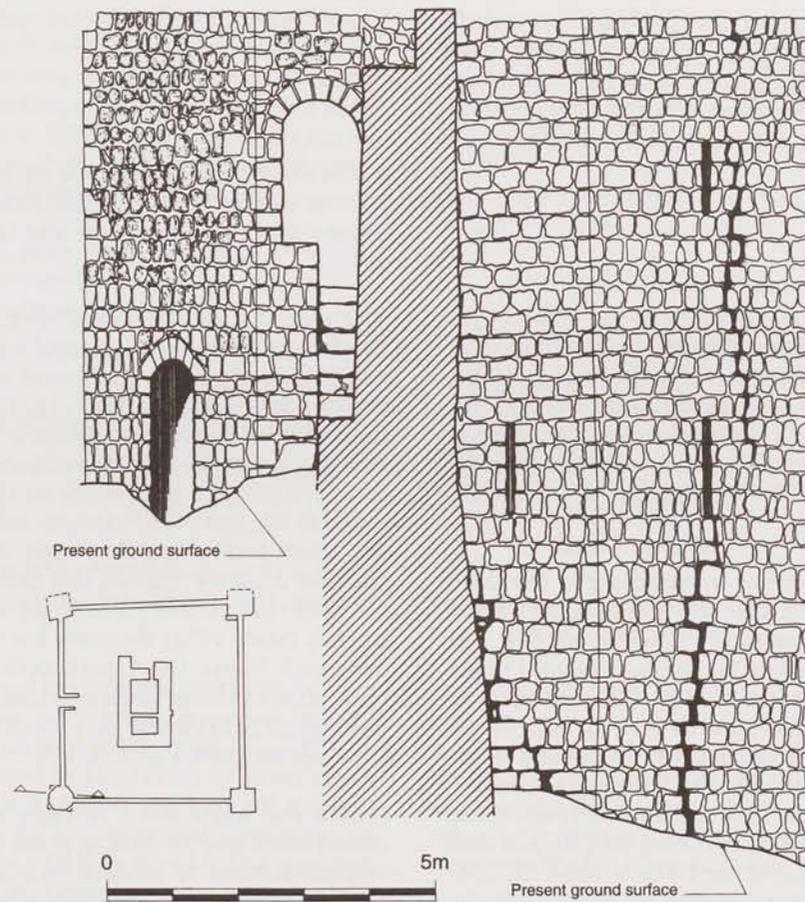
Rās al-'Ayn (No. 117). Elevation of south-west corner tower.
